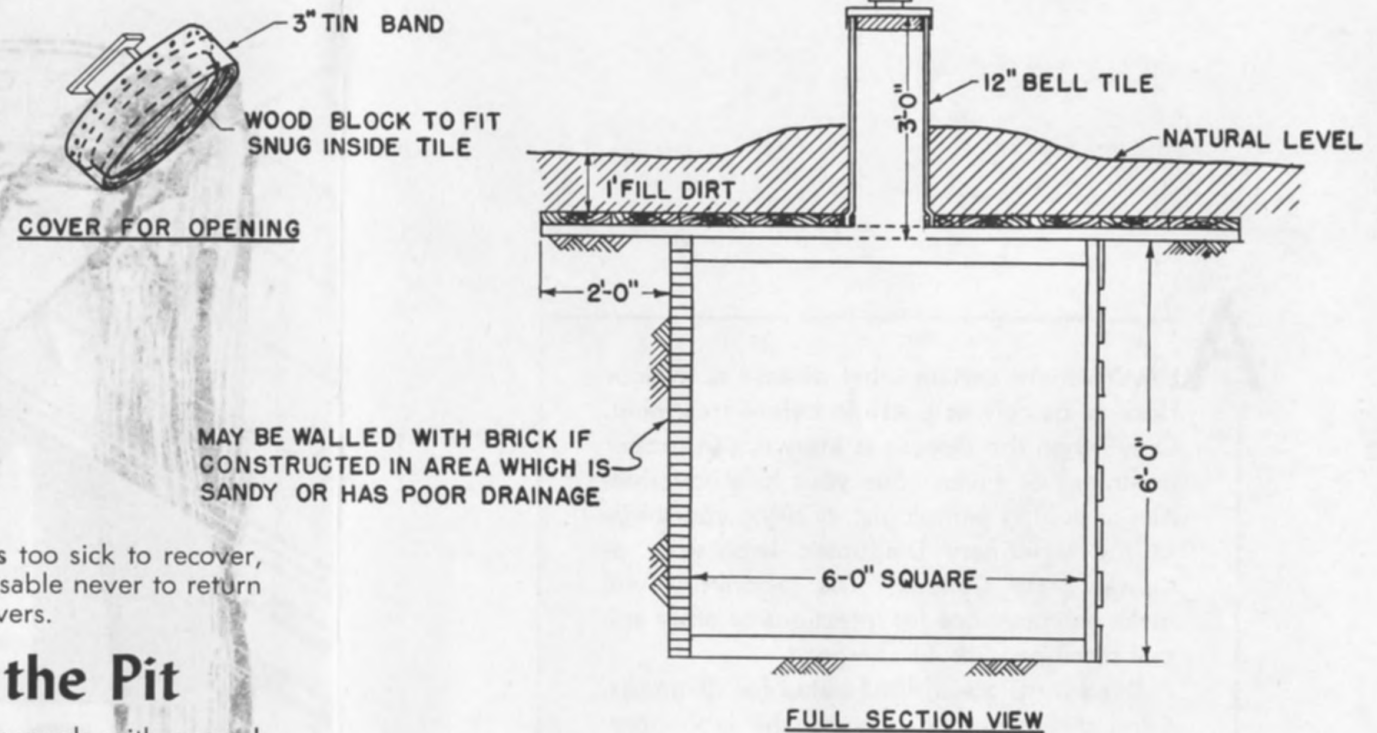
Plan 77-802, how to build a poultry disposal pit.
